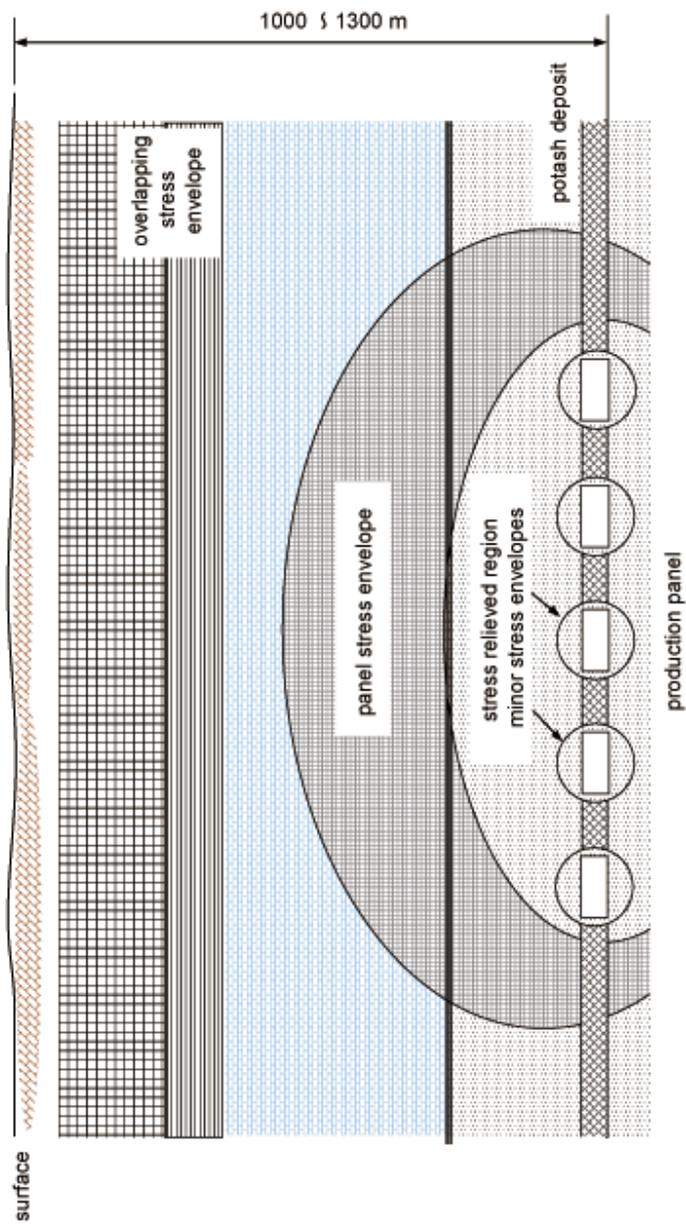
Stress Control Method applied to stabilize deep underground openings
